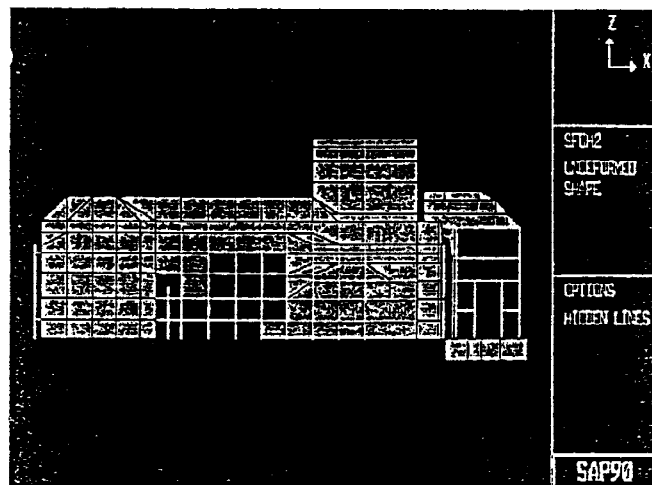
B SECTION OF MAIN HOUSE AND ANNEX
